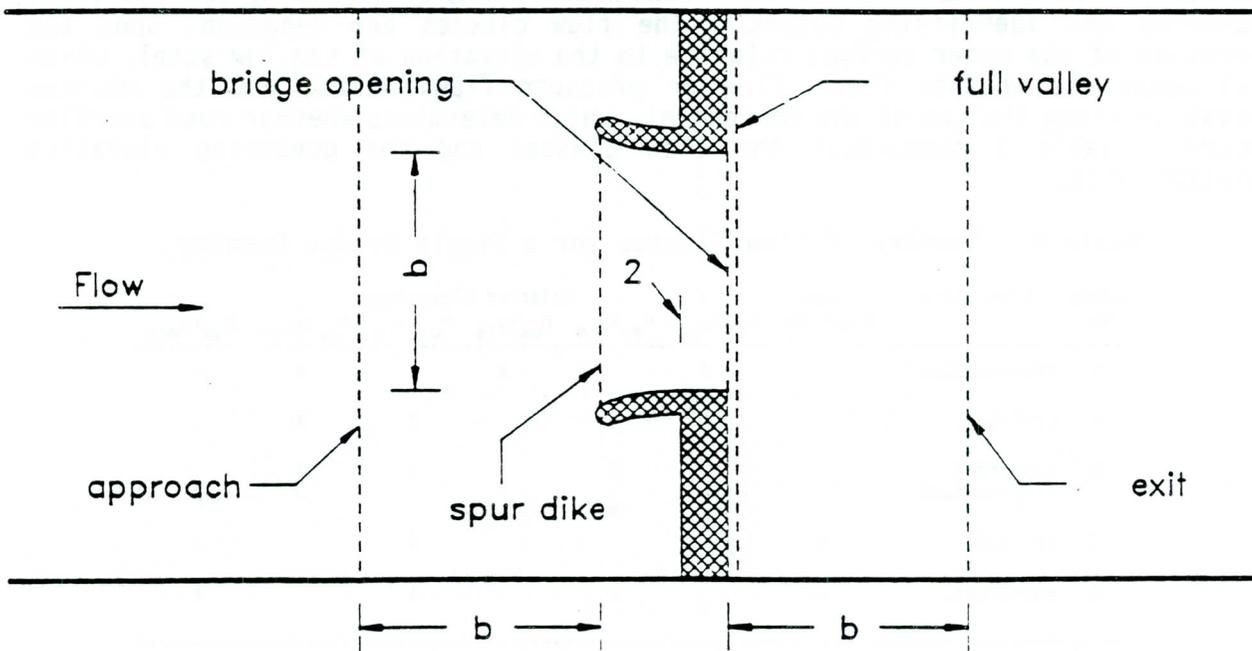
Schematic of Single Bridge Opening with Spur Dikes
